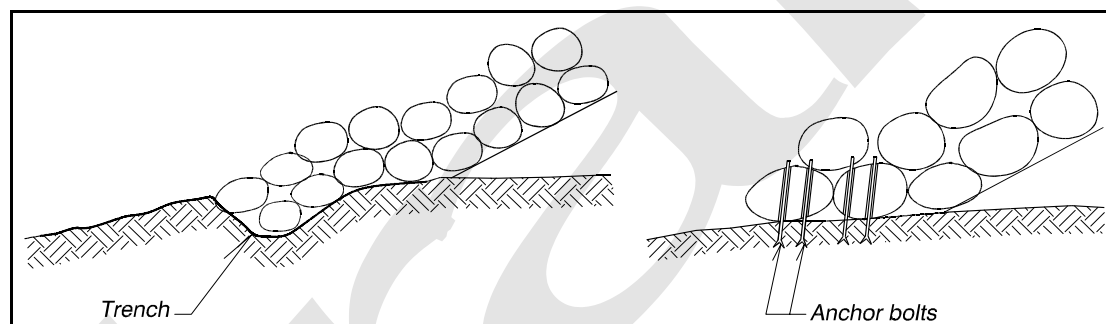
Support of the stones by a trench or anchor bolts
